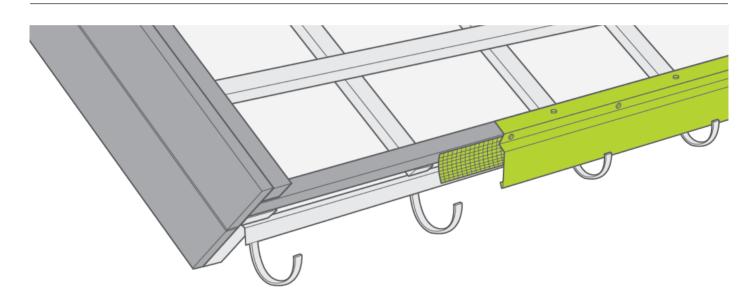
5 INSTALLING BIRD PROTECTION GRID AND EAVES FLASHING
